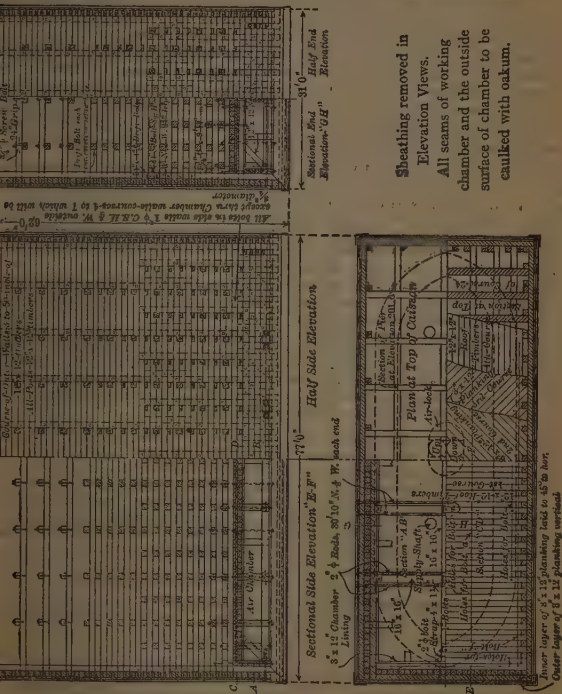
Pneumatic Caisson and Crib for Second Memphis Bridge
